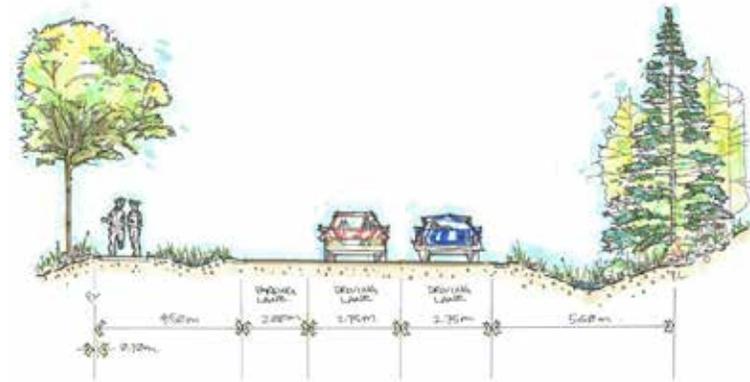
Residential Local 2-Way (RL2 - Parking one side) (17.5 m)
